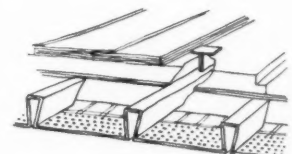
, typical commercial light-gauge pressed steel sections (above) and composite wall, floor and roof units (right) in use in the USA.
